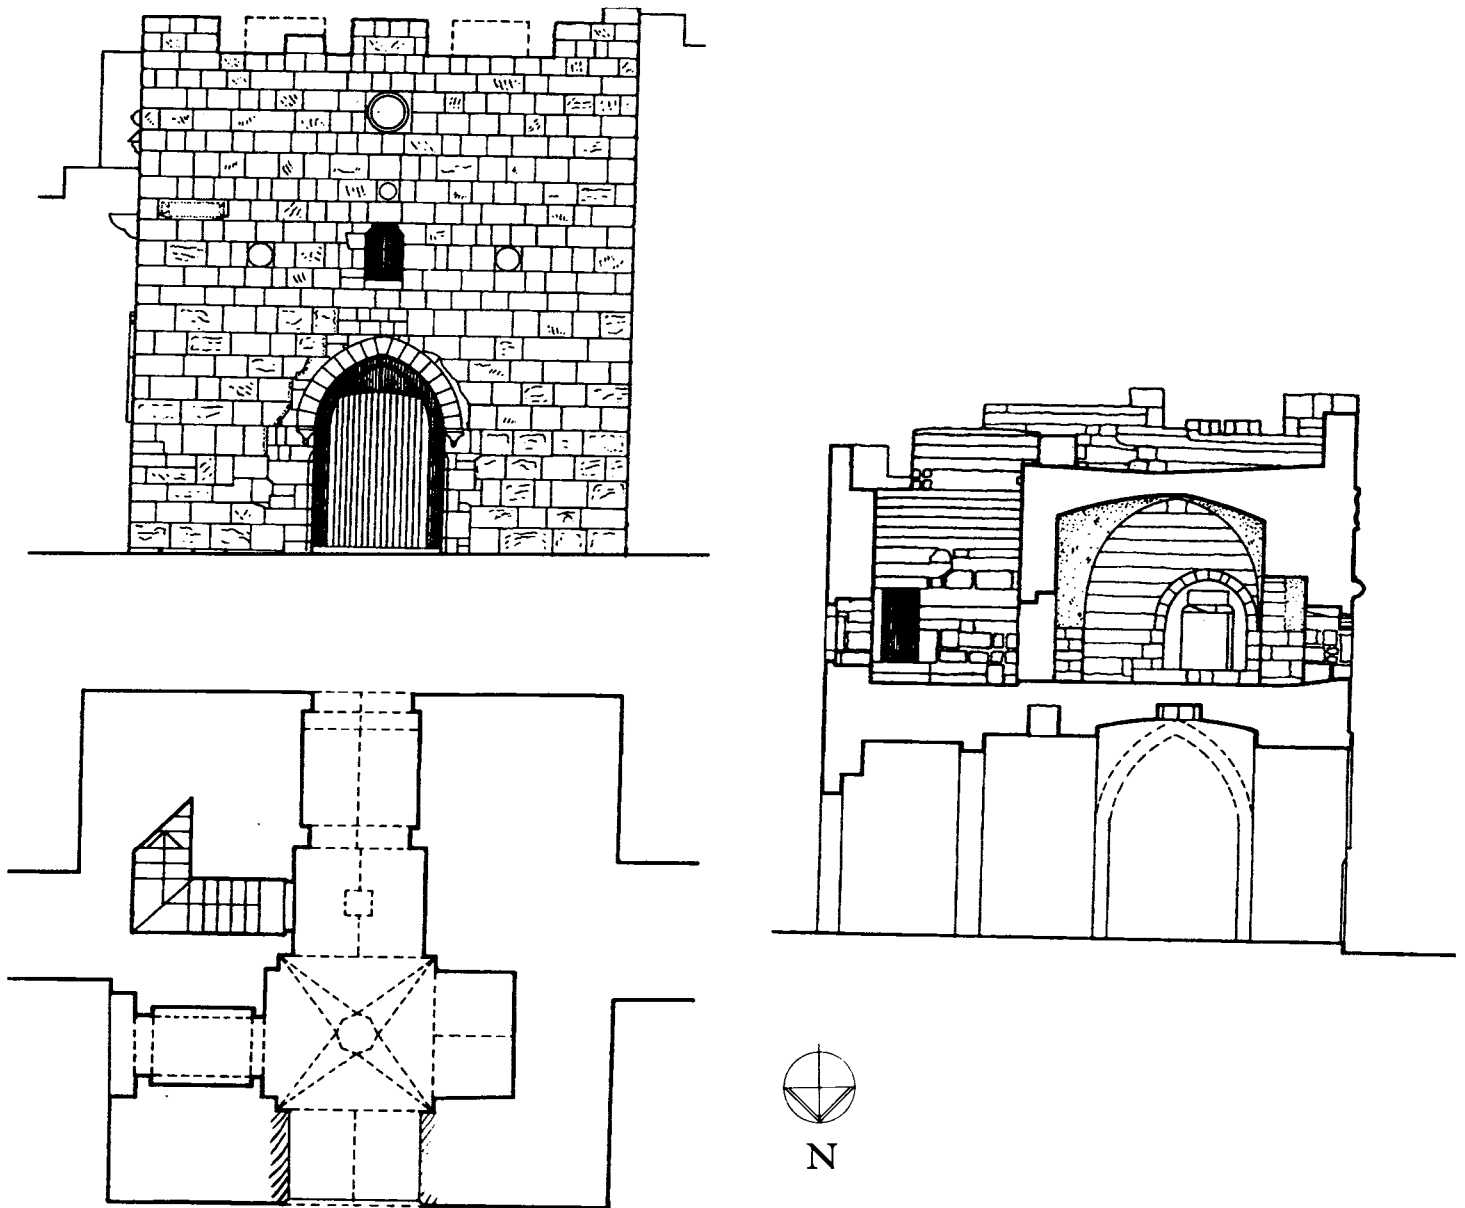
Herod's Gate (Bab al-Zahra) (B)—North elevation; N-S section; and ground plan.
